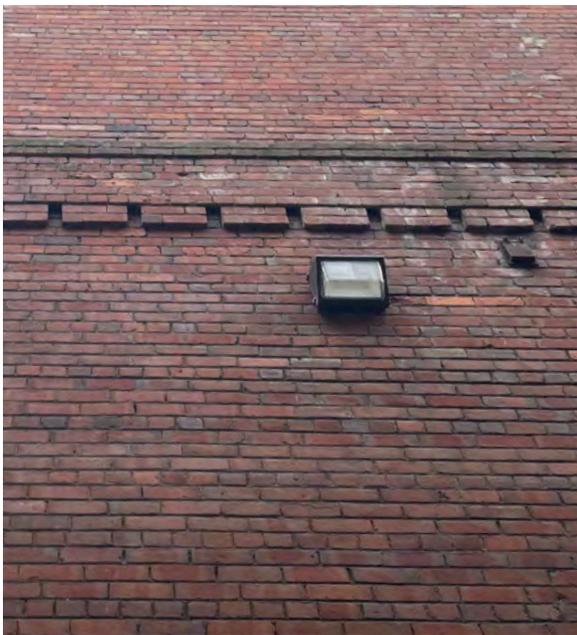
North elevation, second floor banding with mortar loss, spalling and soiling (ERA, 2022).
